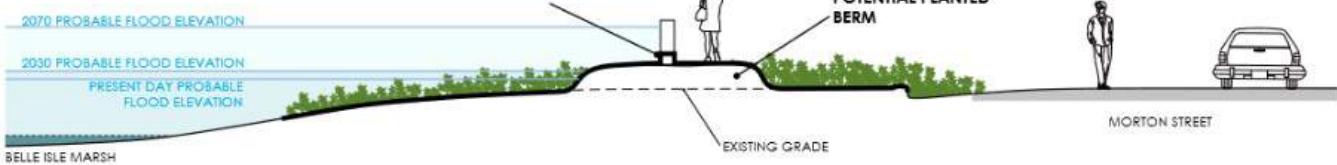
Conceptual design for elevated and planted berm along Morton St, Winthrop, MA. Model efforts found the adaptation strategy is insufficient on its own to provide adequate protection, as flood pathways to the west through the existing boat yard and stormwater issues remain unaddressed (Town of Winthrop, 2017).
